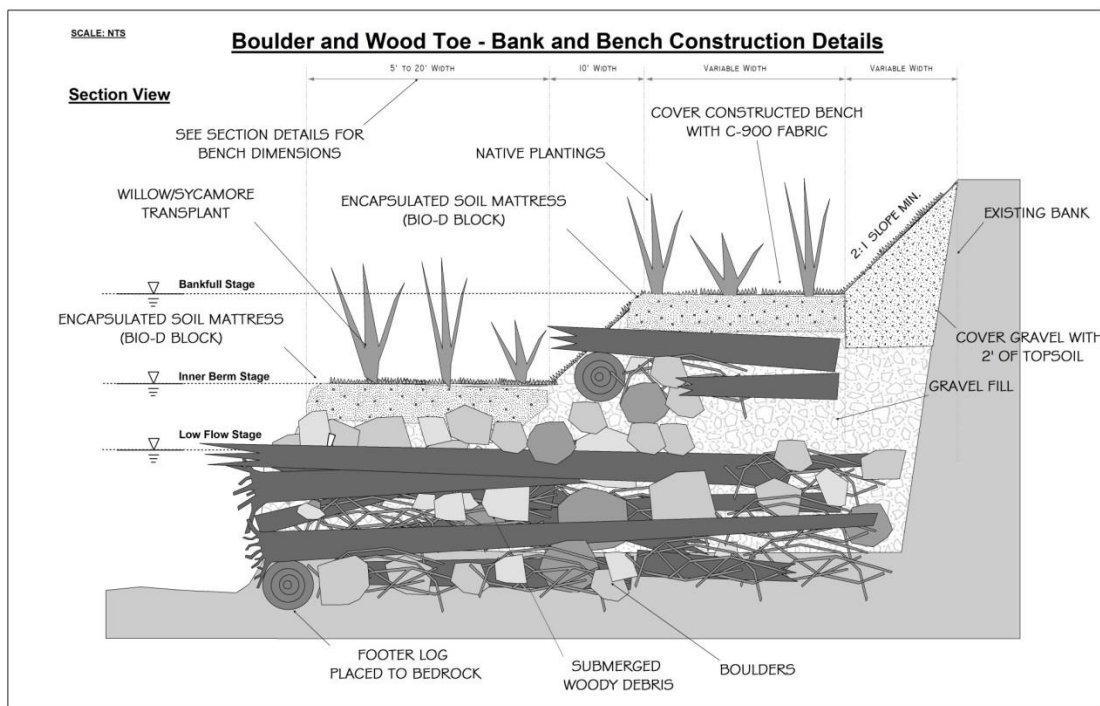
Toe-wood bench design when constructing on bedrock. Drawing also shows inner berm and bankfull elevations.
